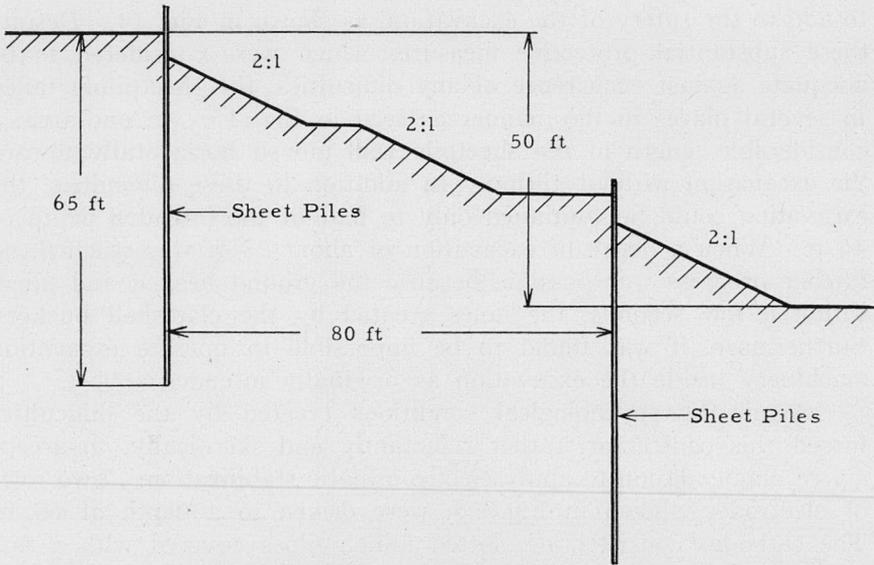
SECTION THROUGH SLOPE OF EXCAVATION FOR U-BOAT PEN IN NORWAY.
